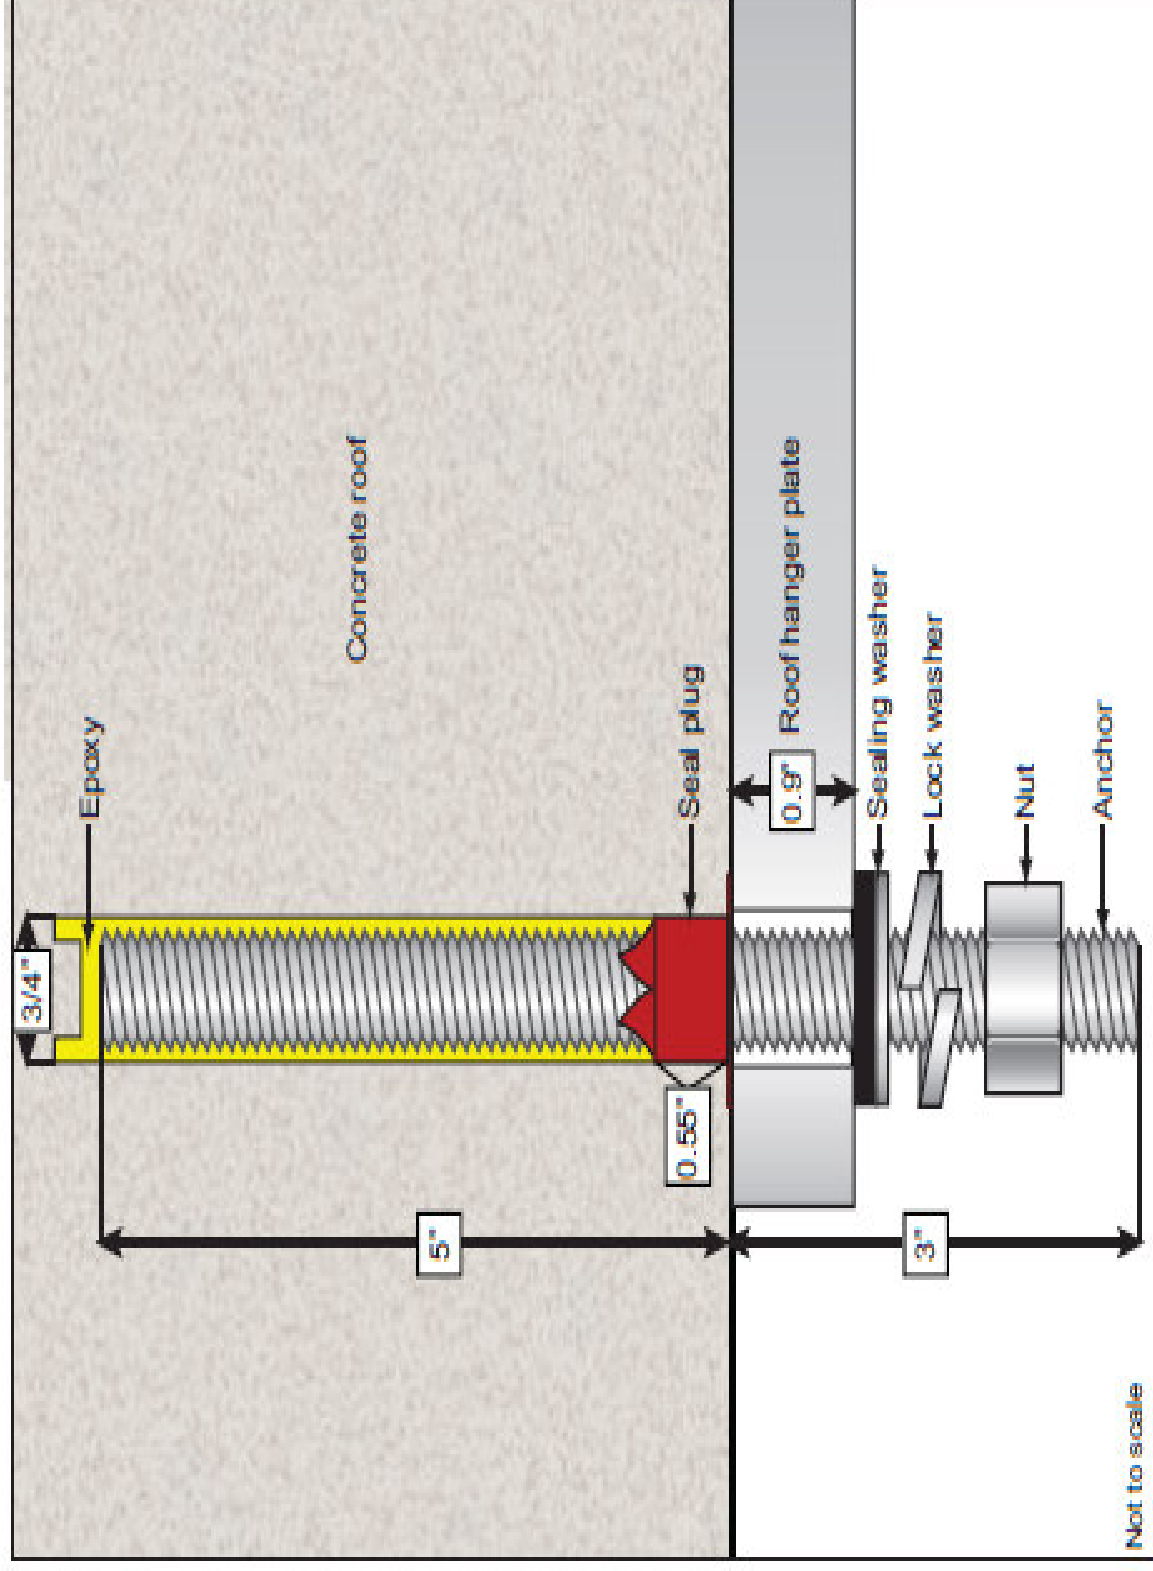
Typical adhesive anchor and roof hanger plate assembly.
